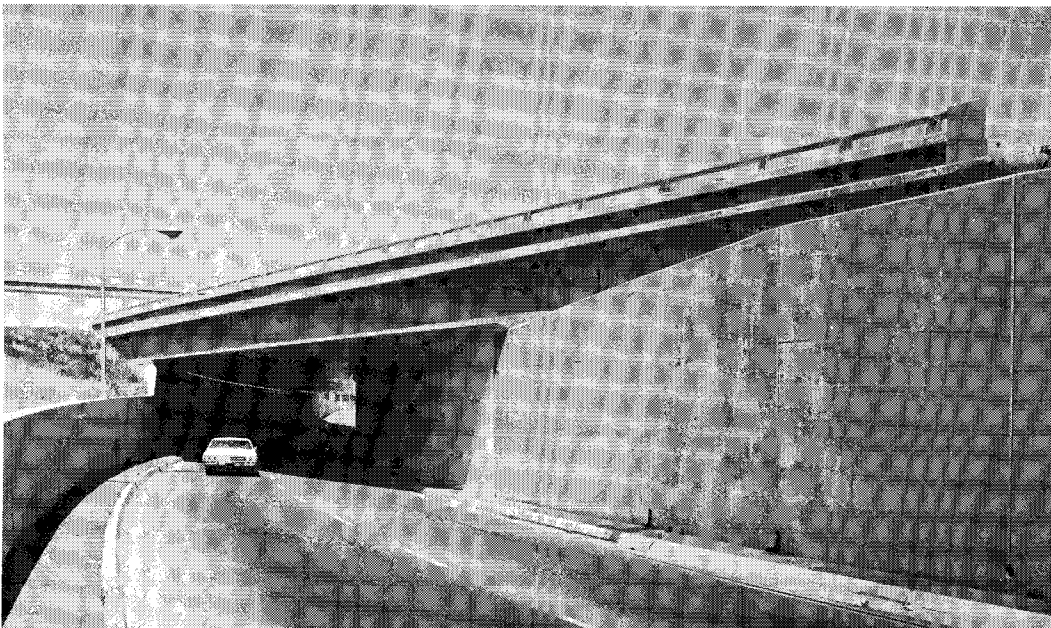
Mac Arthur Boulevard Undercrossing. Elevation of prestressed portal beam.
